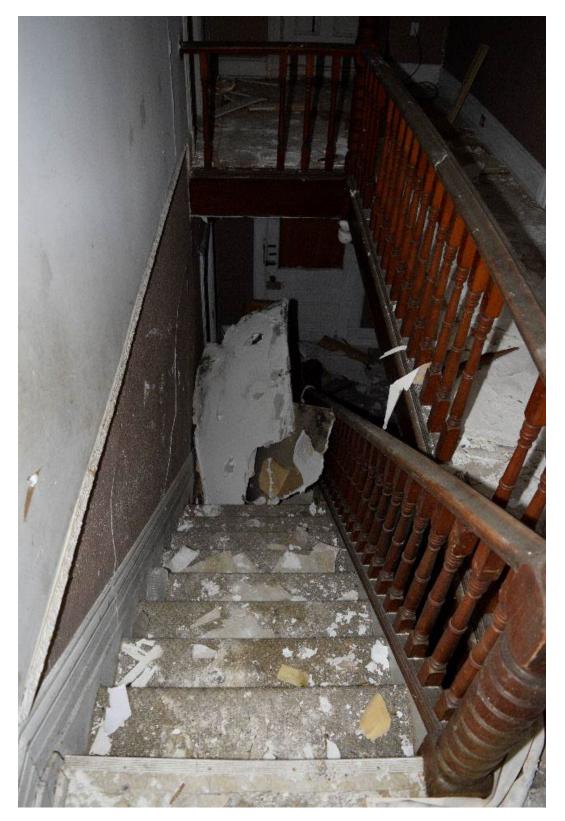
Stairwell, vandals have thrown cast iron tub through the stairs, currently covered in drywall, facing south
